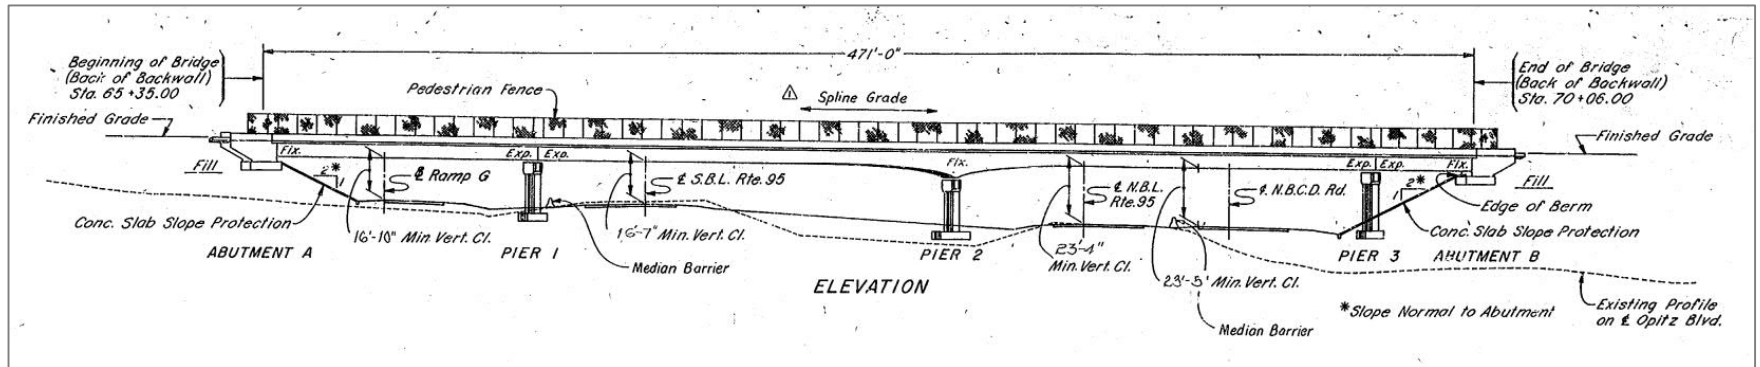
Existing Bridge Elevation (Reference: VDOT, 1979, Sheet 2 of 47)
